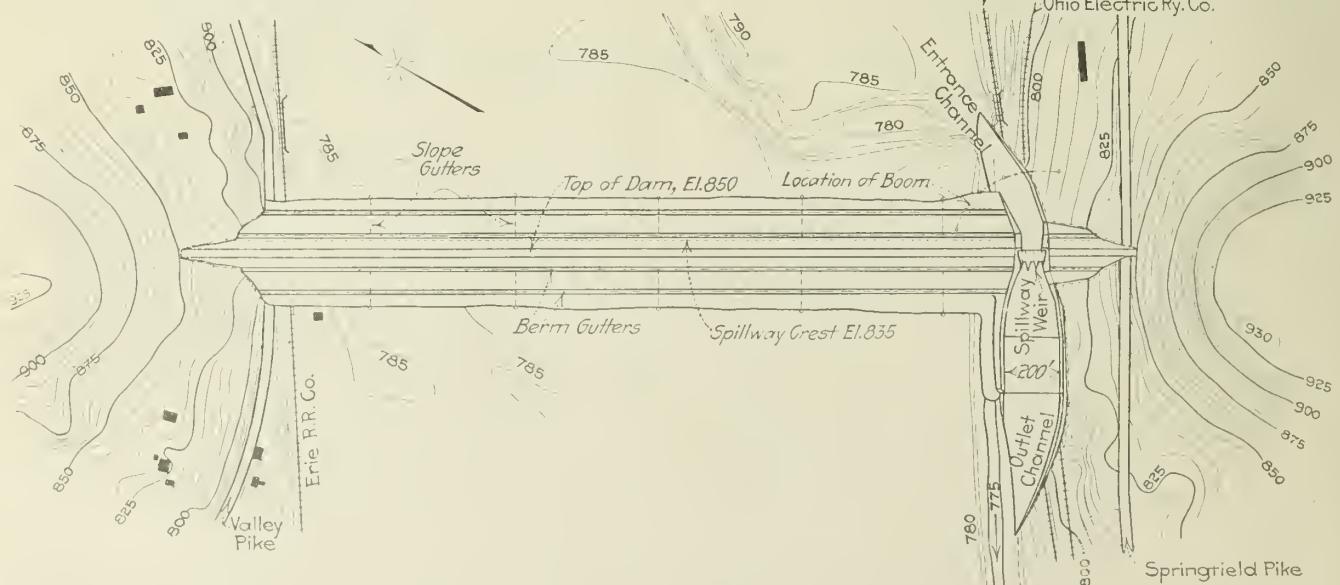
PLAN OF HUFFMAN DAM, WITH COMBINED SPILLWAY AND CONDUITS
